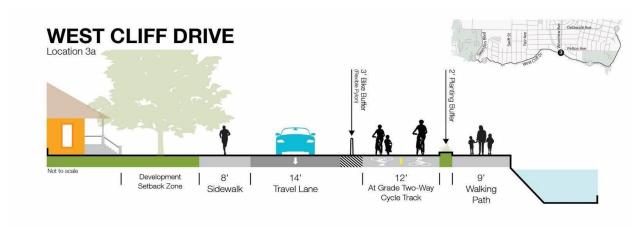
Alternative 2 Concept- Cross Section of Just west of Woodrow Avenue at West Cliff Drive
